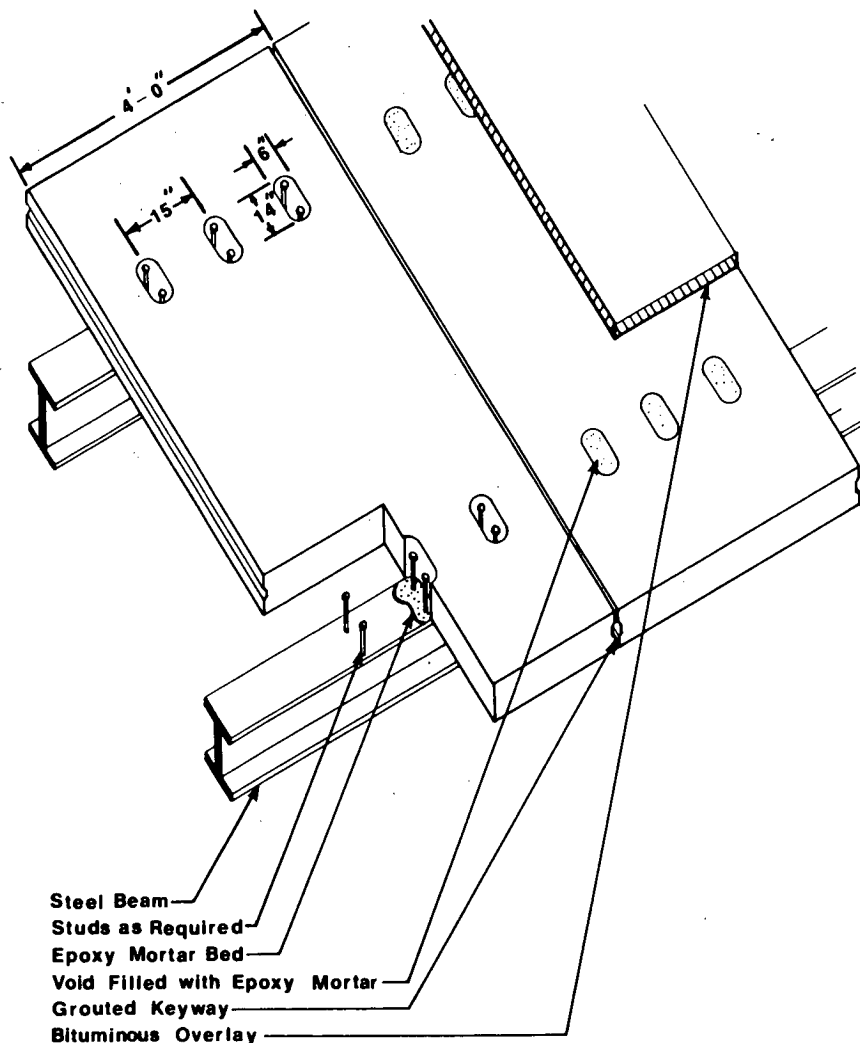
Precast concrete deck panels (See Appendix A, System S-3 for noncomposite and longitudinal panels).
